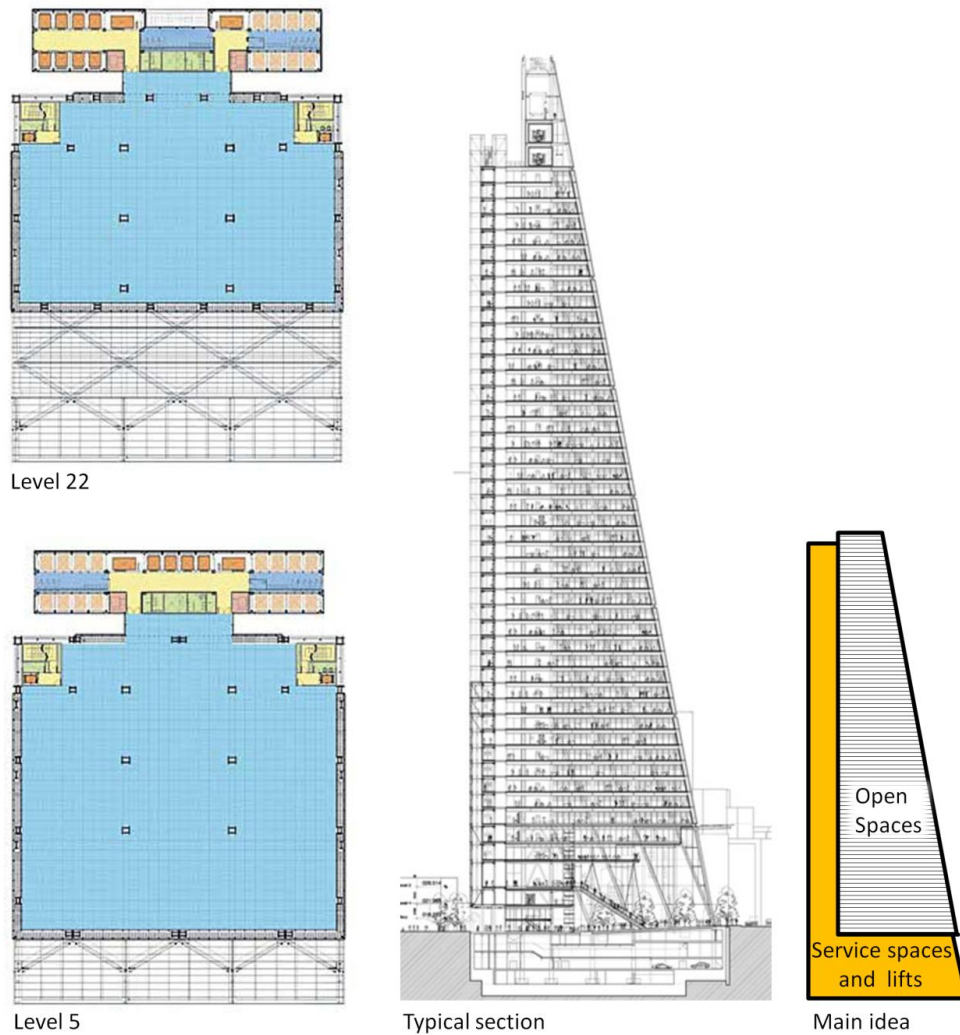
The Leadenhall Building (opened 2014), London, design by Rogers Stirk Harbour + Partners, source of plans and section: (Young et al., 2013)
